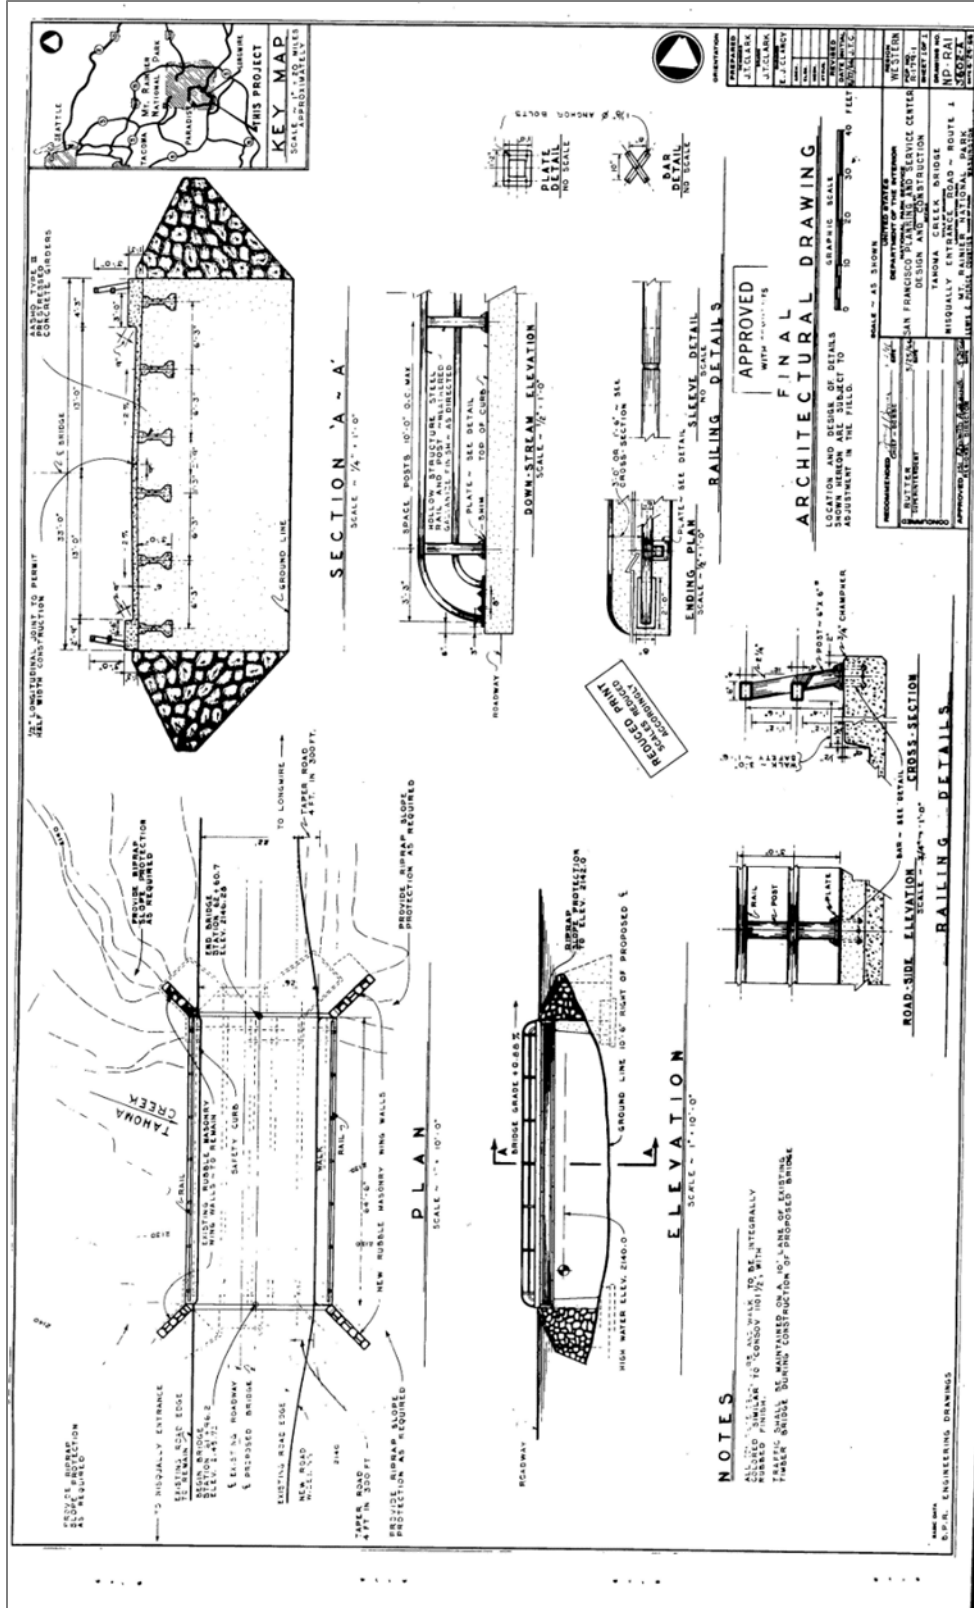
Final architectural designs from 1966, which the existing bridge is based on. The deck spans 20 m (66 ft) over the floodplain, is 10 m (33 ft) wide, and runs at a grade of +0.88% from west to east (Modified from Clark 1966).
